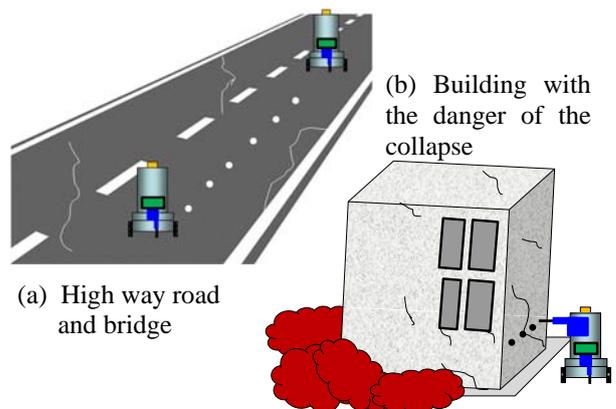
Application plans of disaster sites using mobile robot with grinding drill
